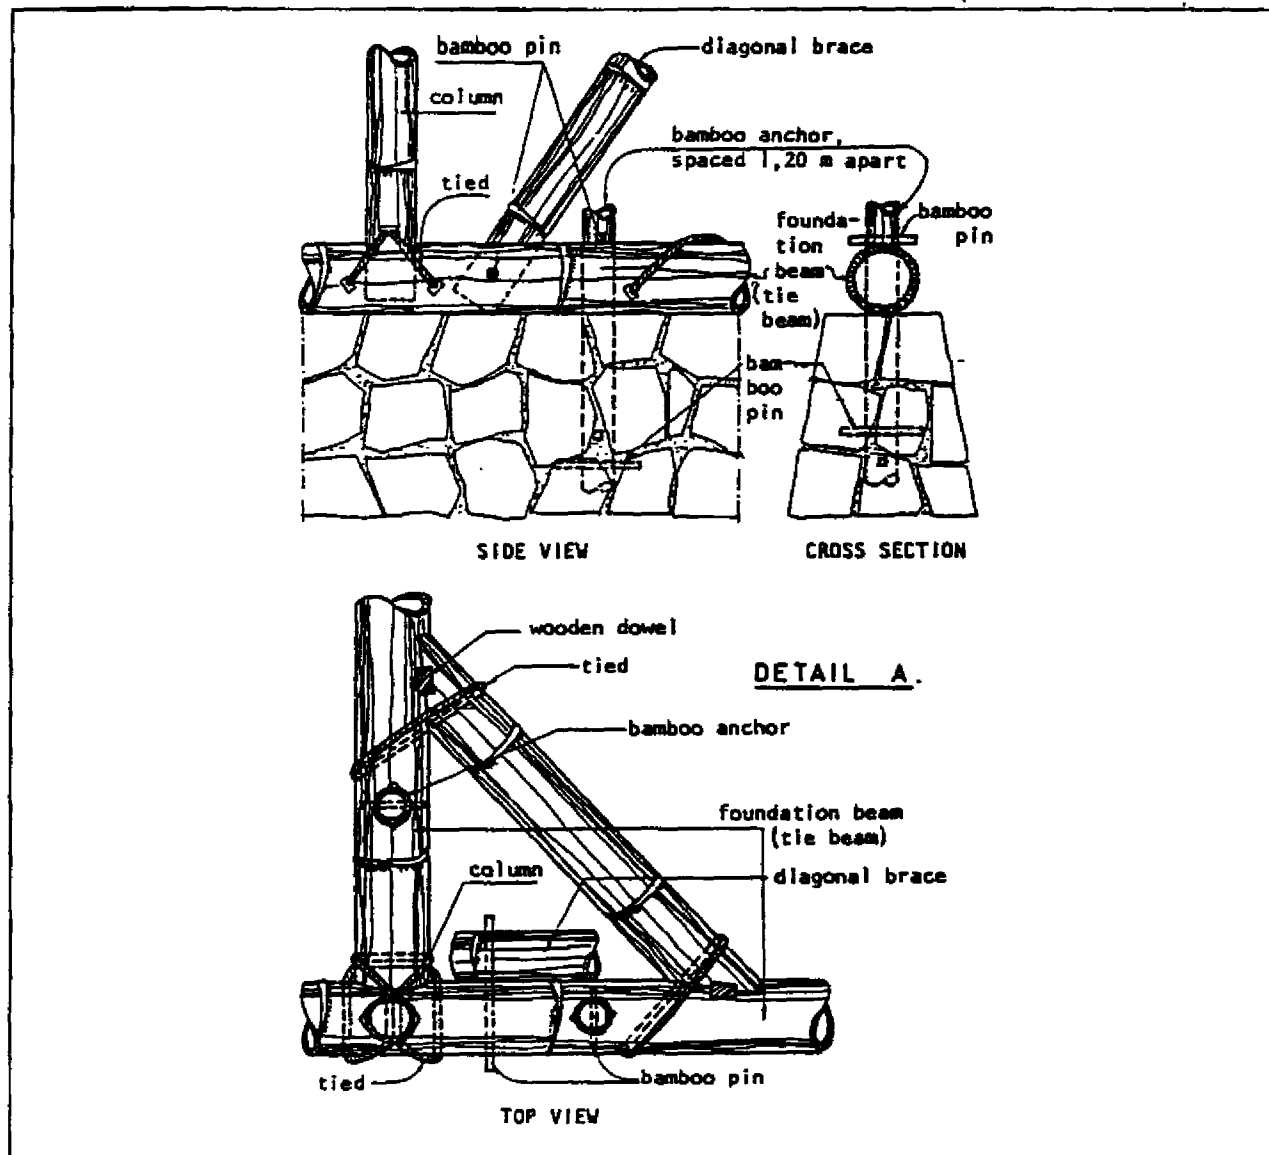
Detail Bamboo Construction (Foundation) [4].
